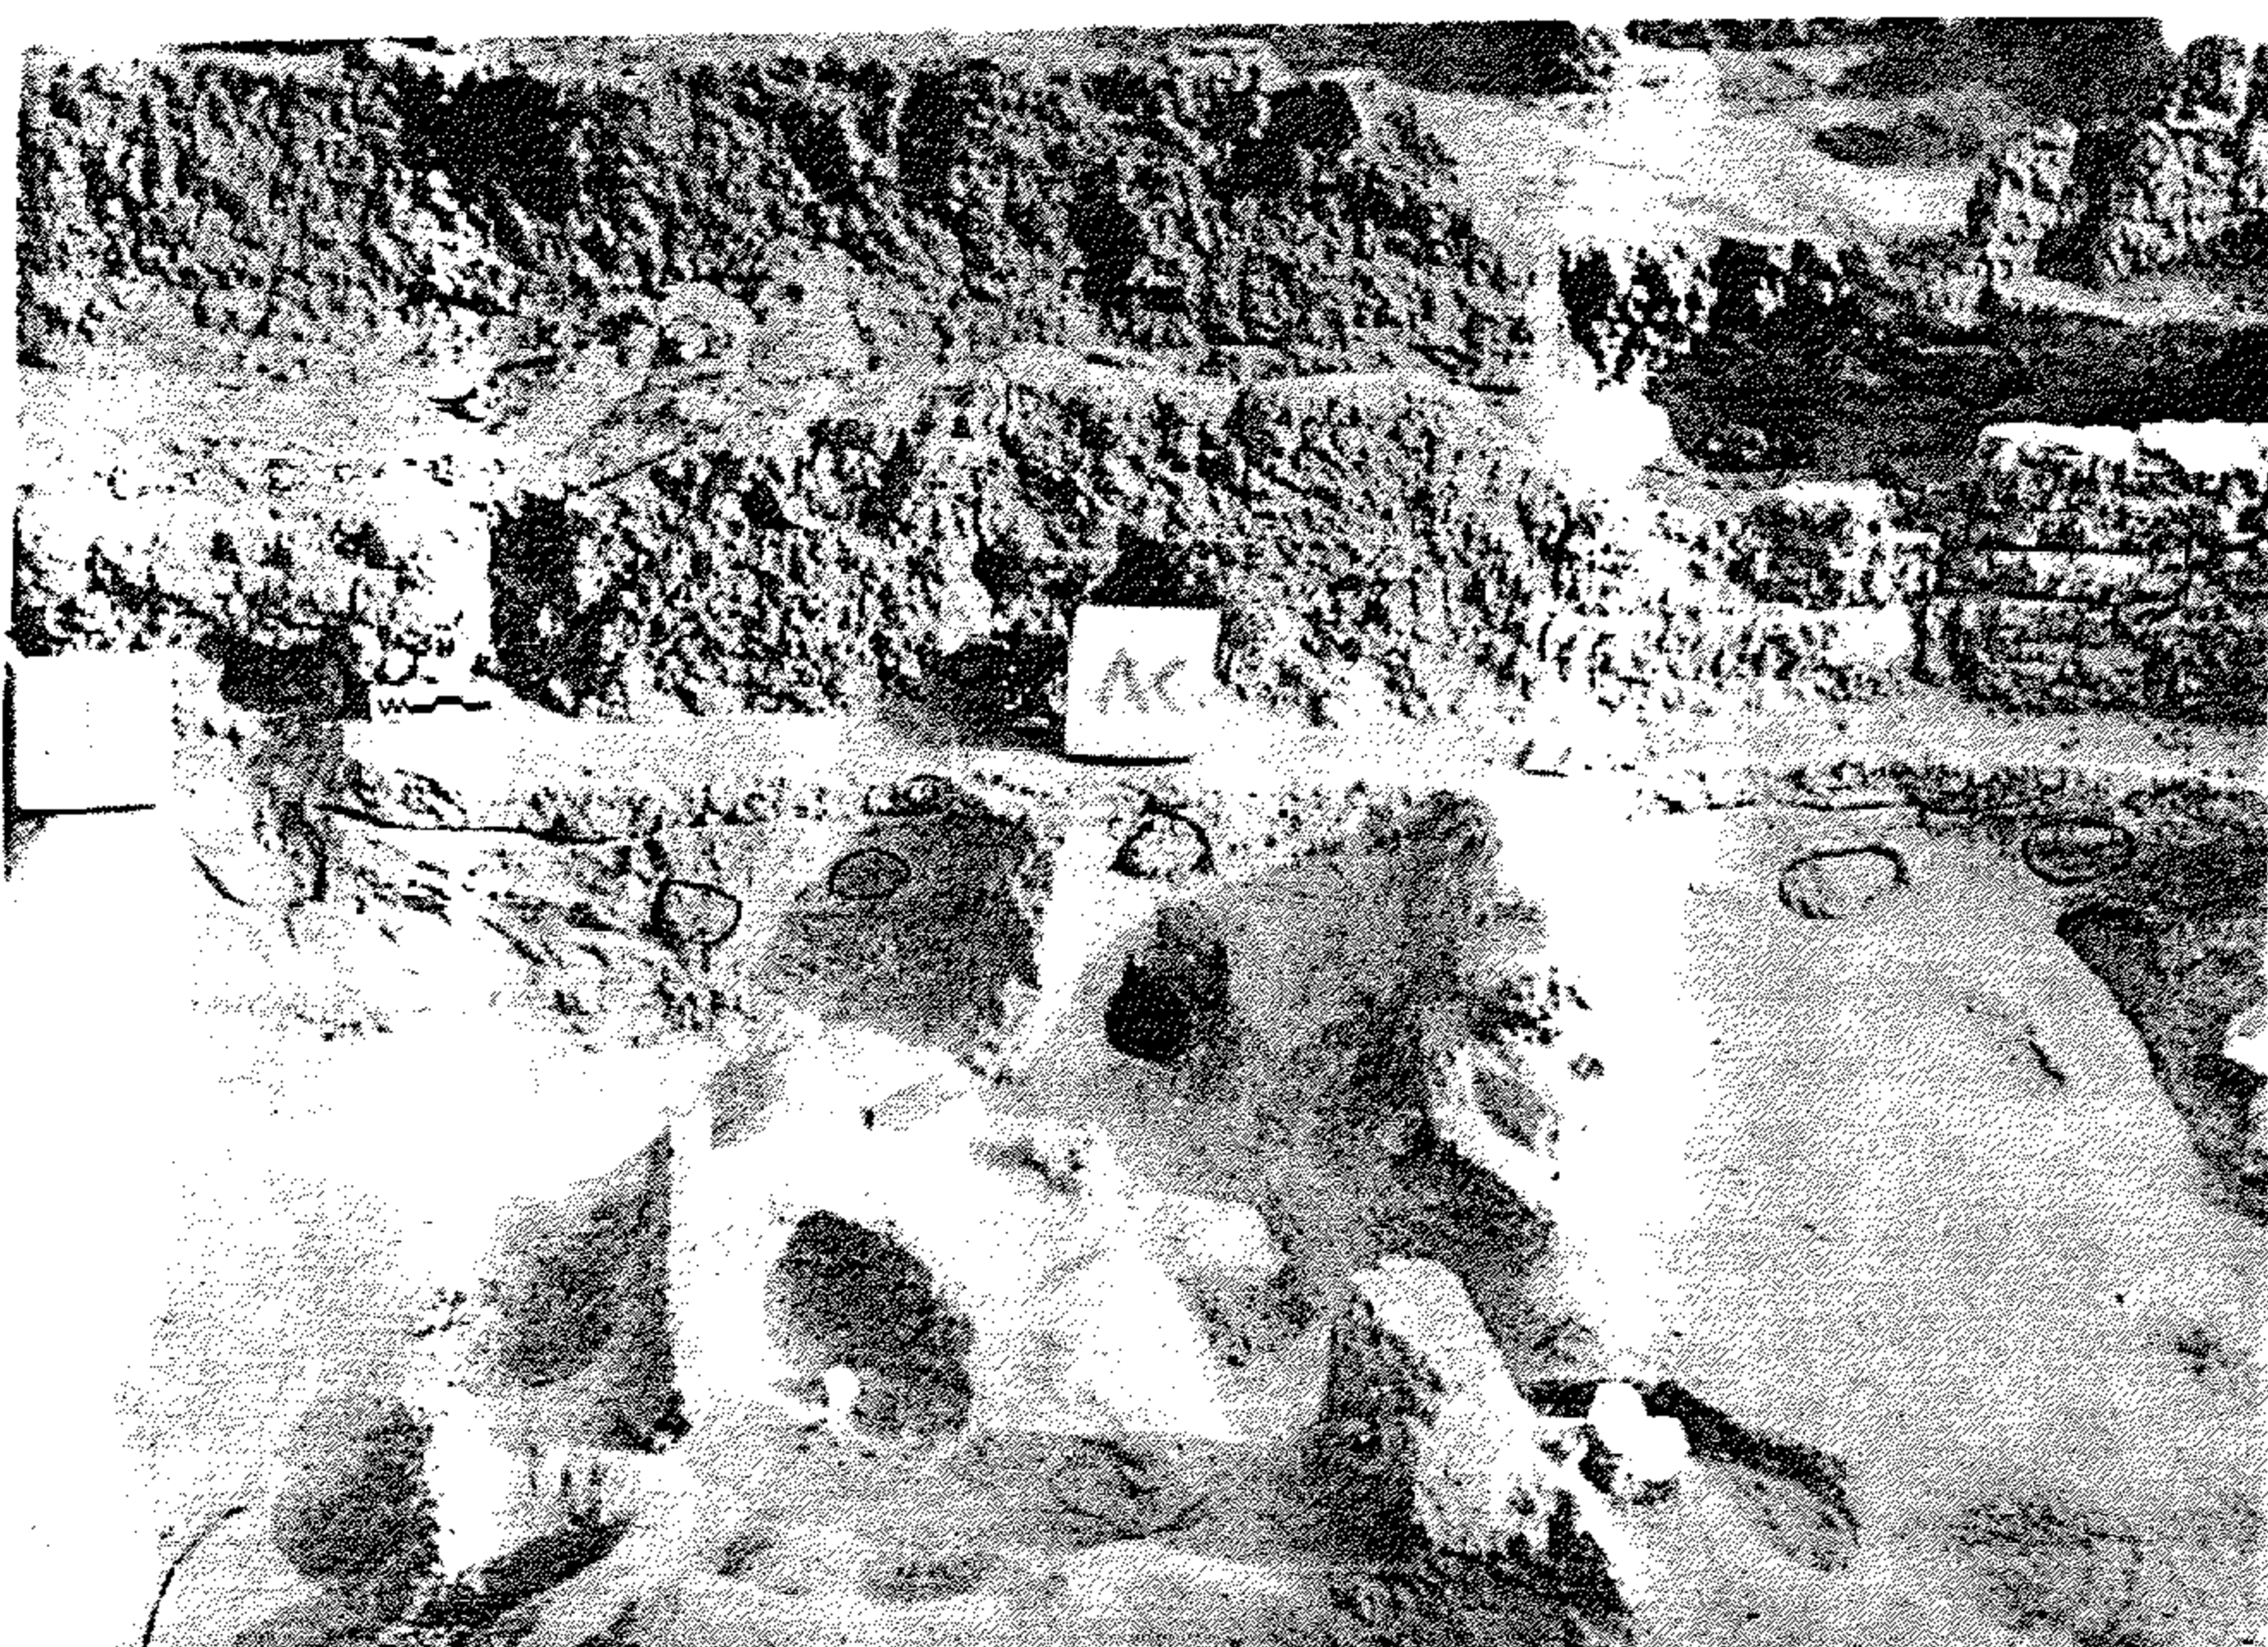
Holes of the Rodents under the ground floor of room No. 82.
